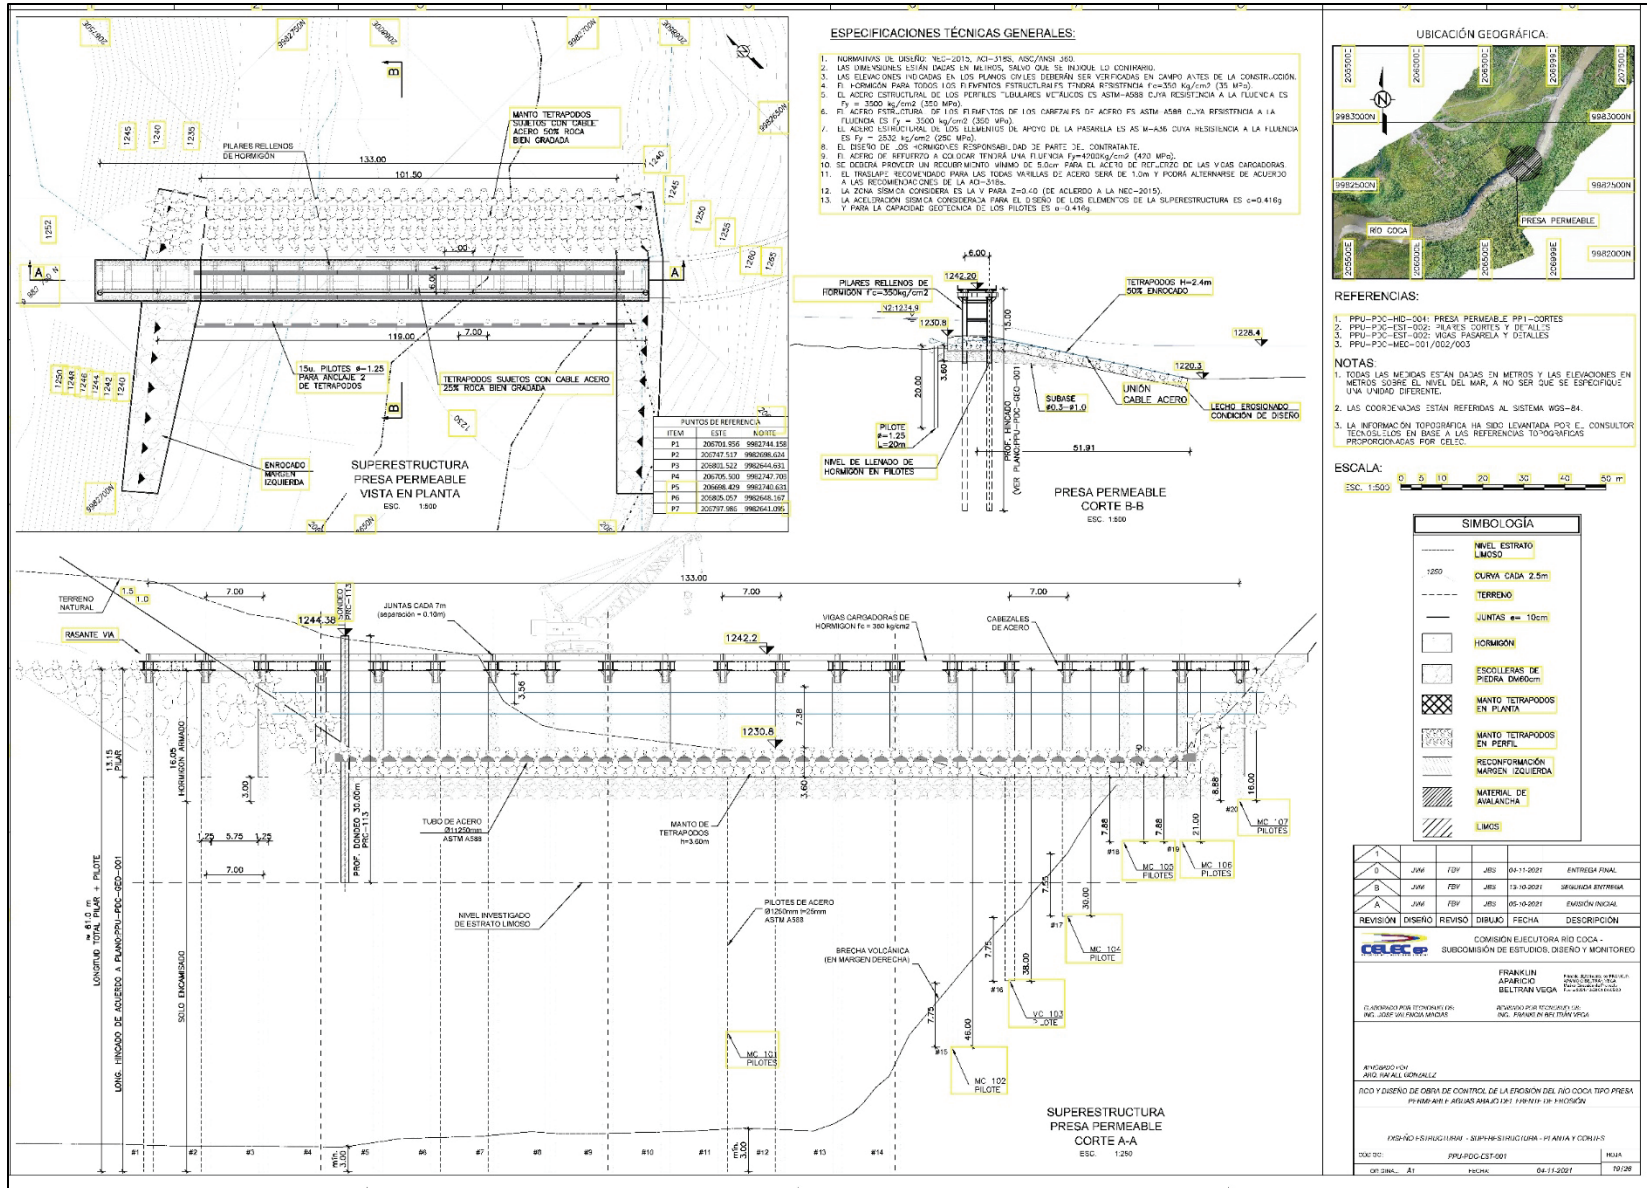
Initial permeable dam design—details of bridge and piers (CELEC, with permission).
